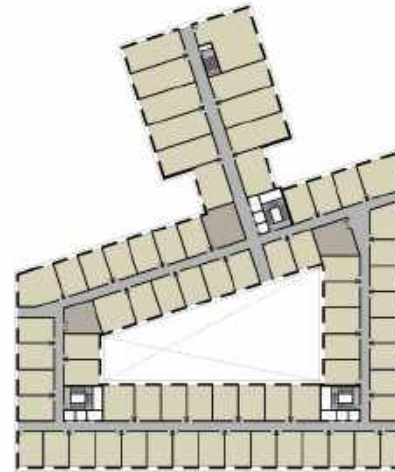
Typical floor of the 4-5* Hotel in Irfan Central Boulevard
